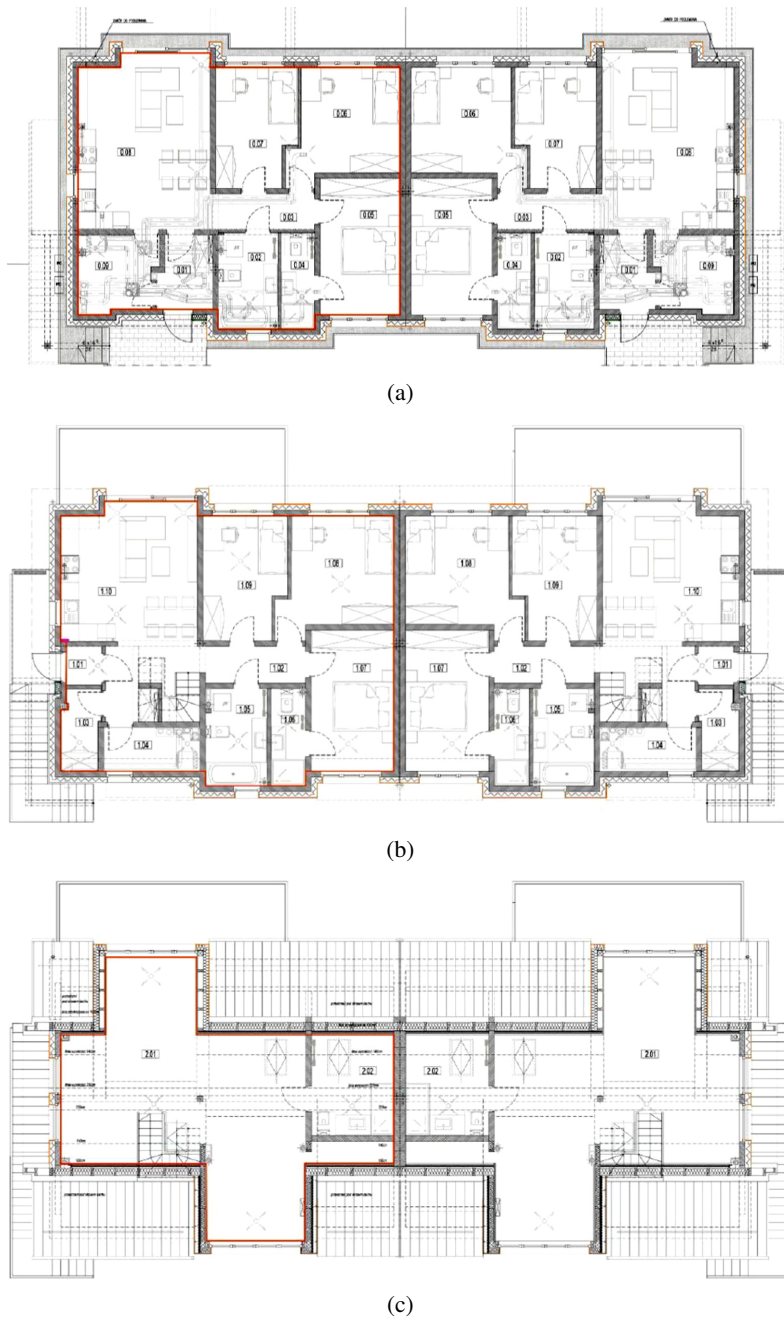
Analysed building (a) ground floor; (b) first floor; (c) usable attic
